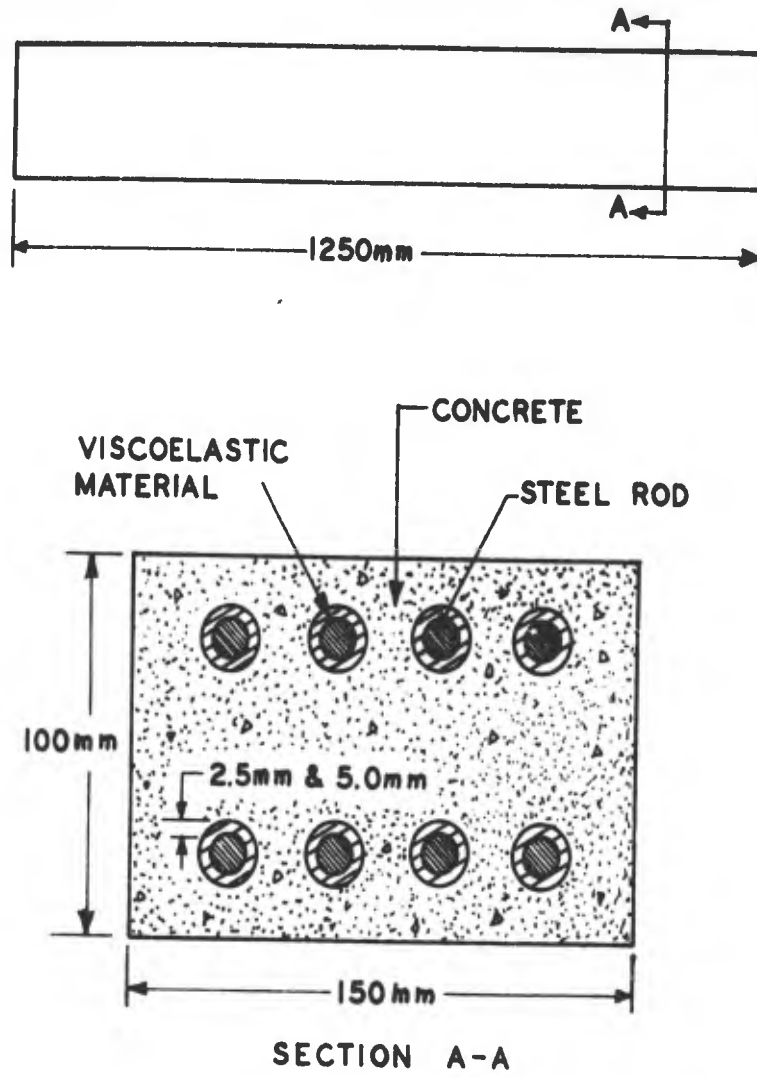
Concrete Test Bar with Viscoelastic-Covered Steel Reinforcement Rods
